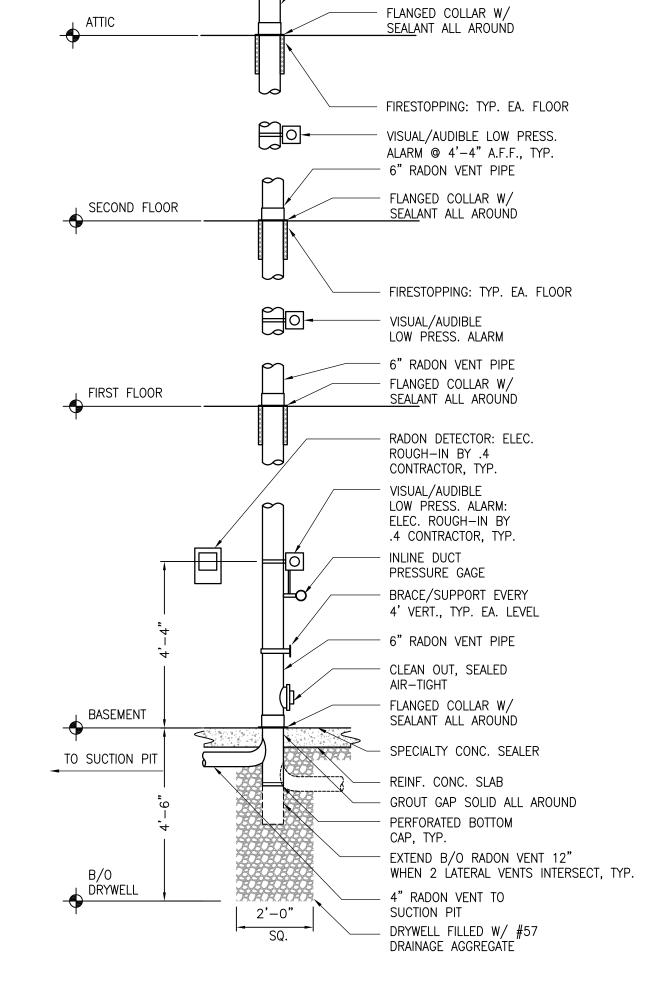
TYPICAL SUCTION PIT DETAIL N.T.S.
